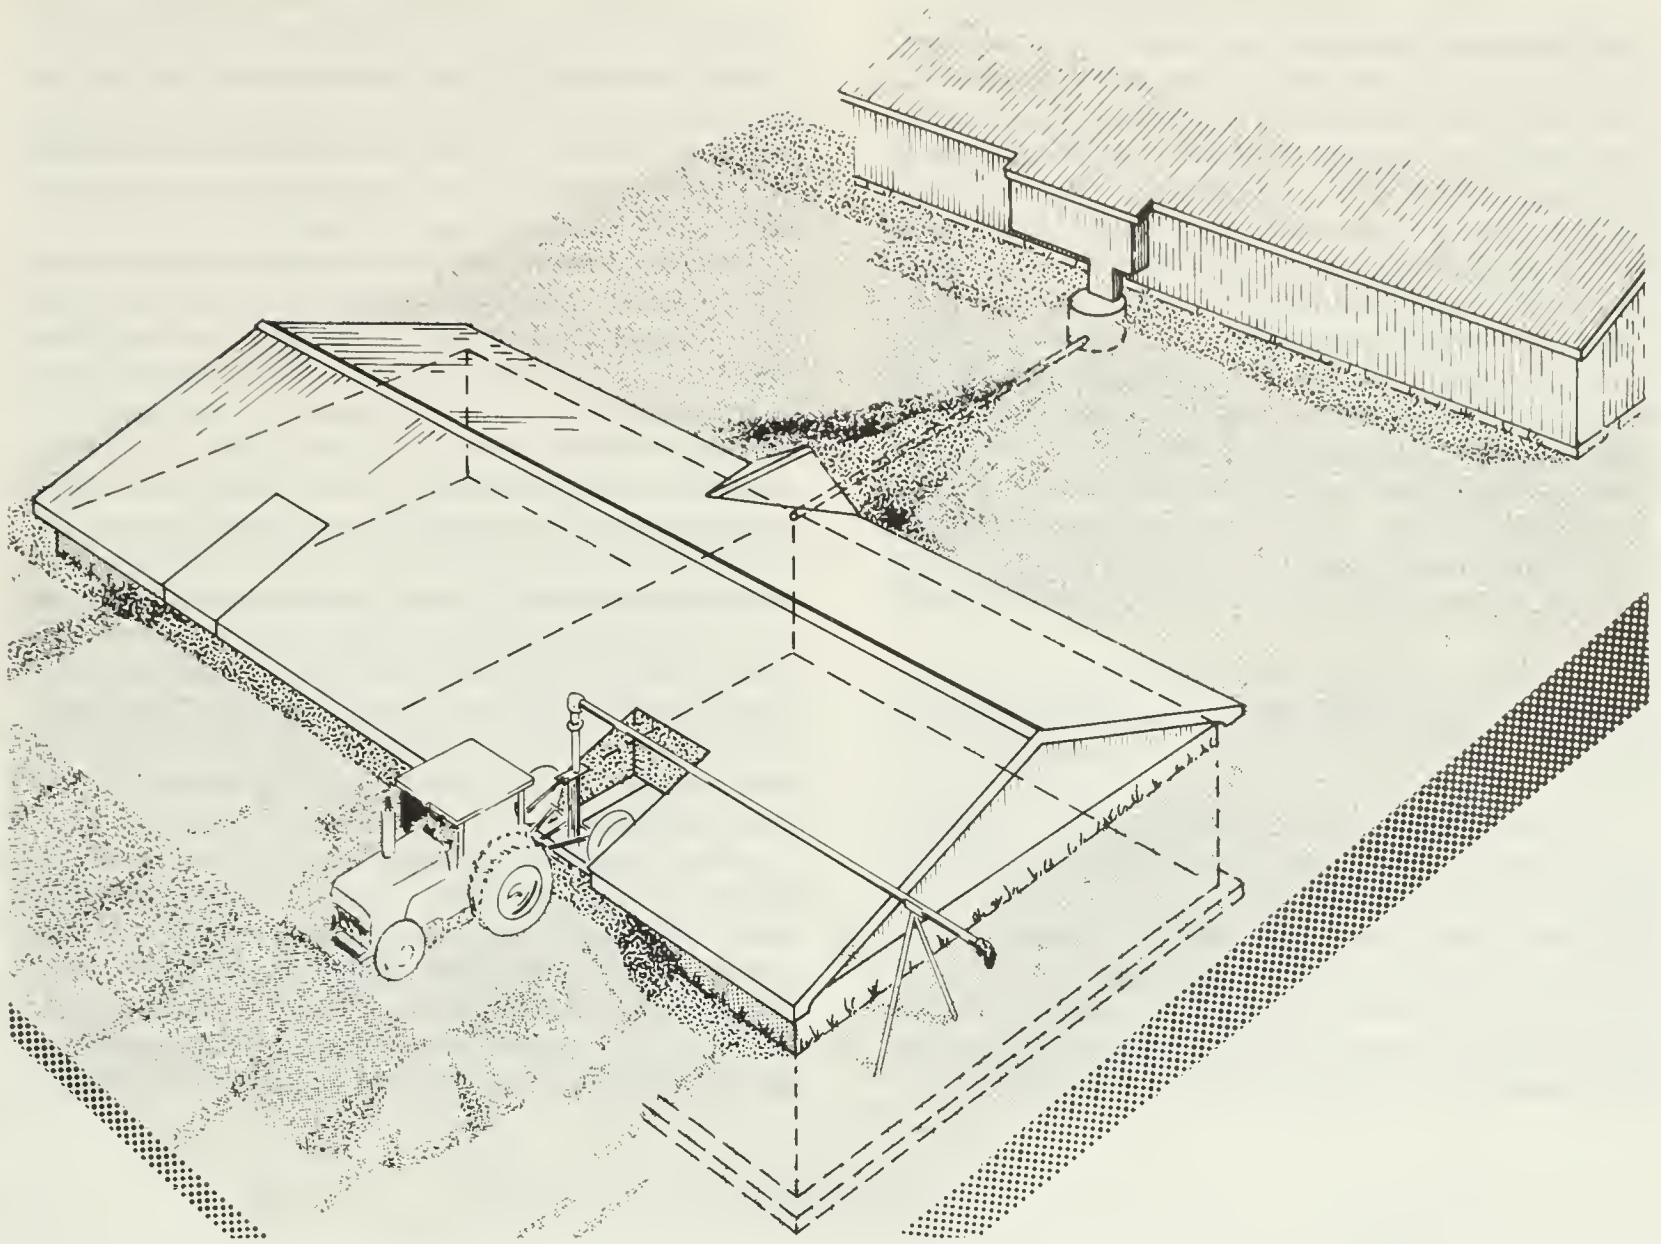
Rectangular roofer manure tank (CPS plan M-3753)
